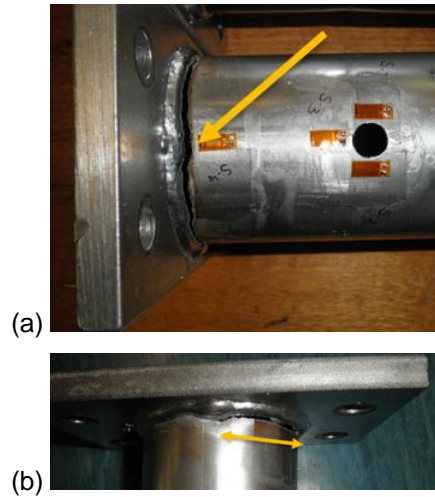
(a) Crack beside the welding for QWE.4, (b) propagation of the crack towards the nominal neutral axis.
